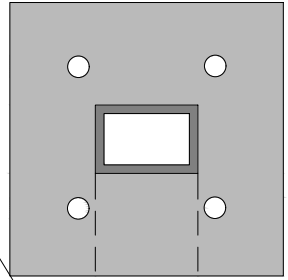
DETAIL-PLI-DEK "U" SYSTEM - MASONRY OR CONCRETE OVERLAY - INCLEMENT WEATHER
